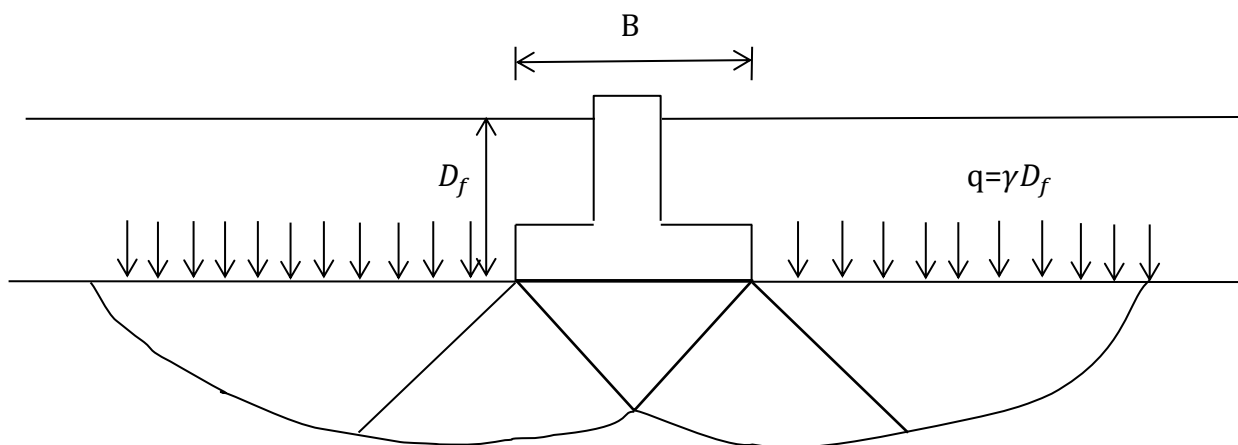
Failure mode in soil under a rough rigid strip footing subjected to vertical load. (Terzaghi, 1943)
